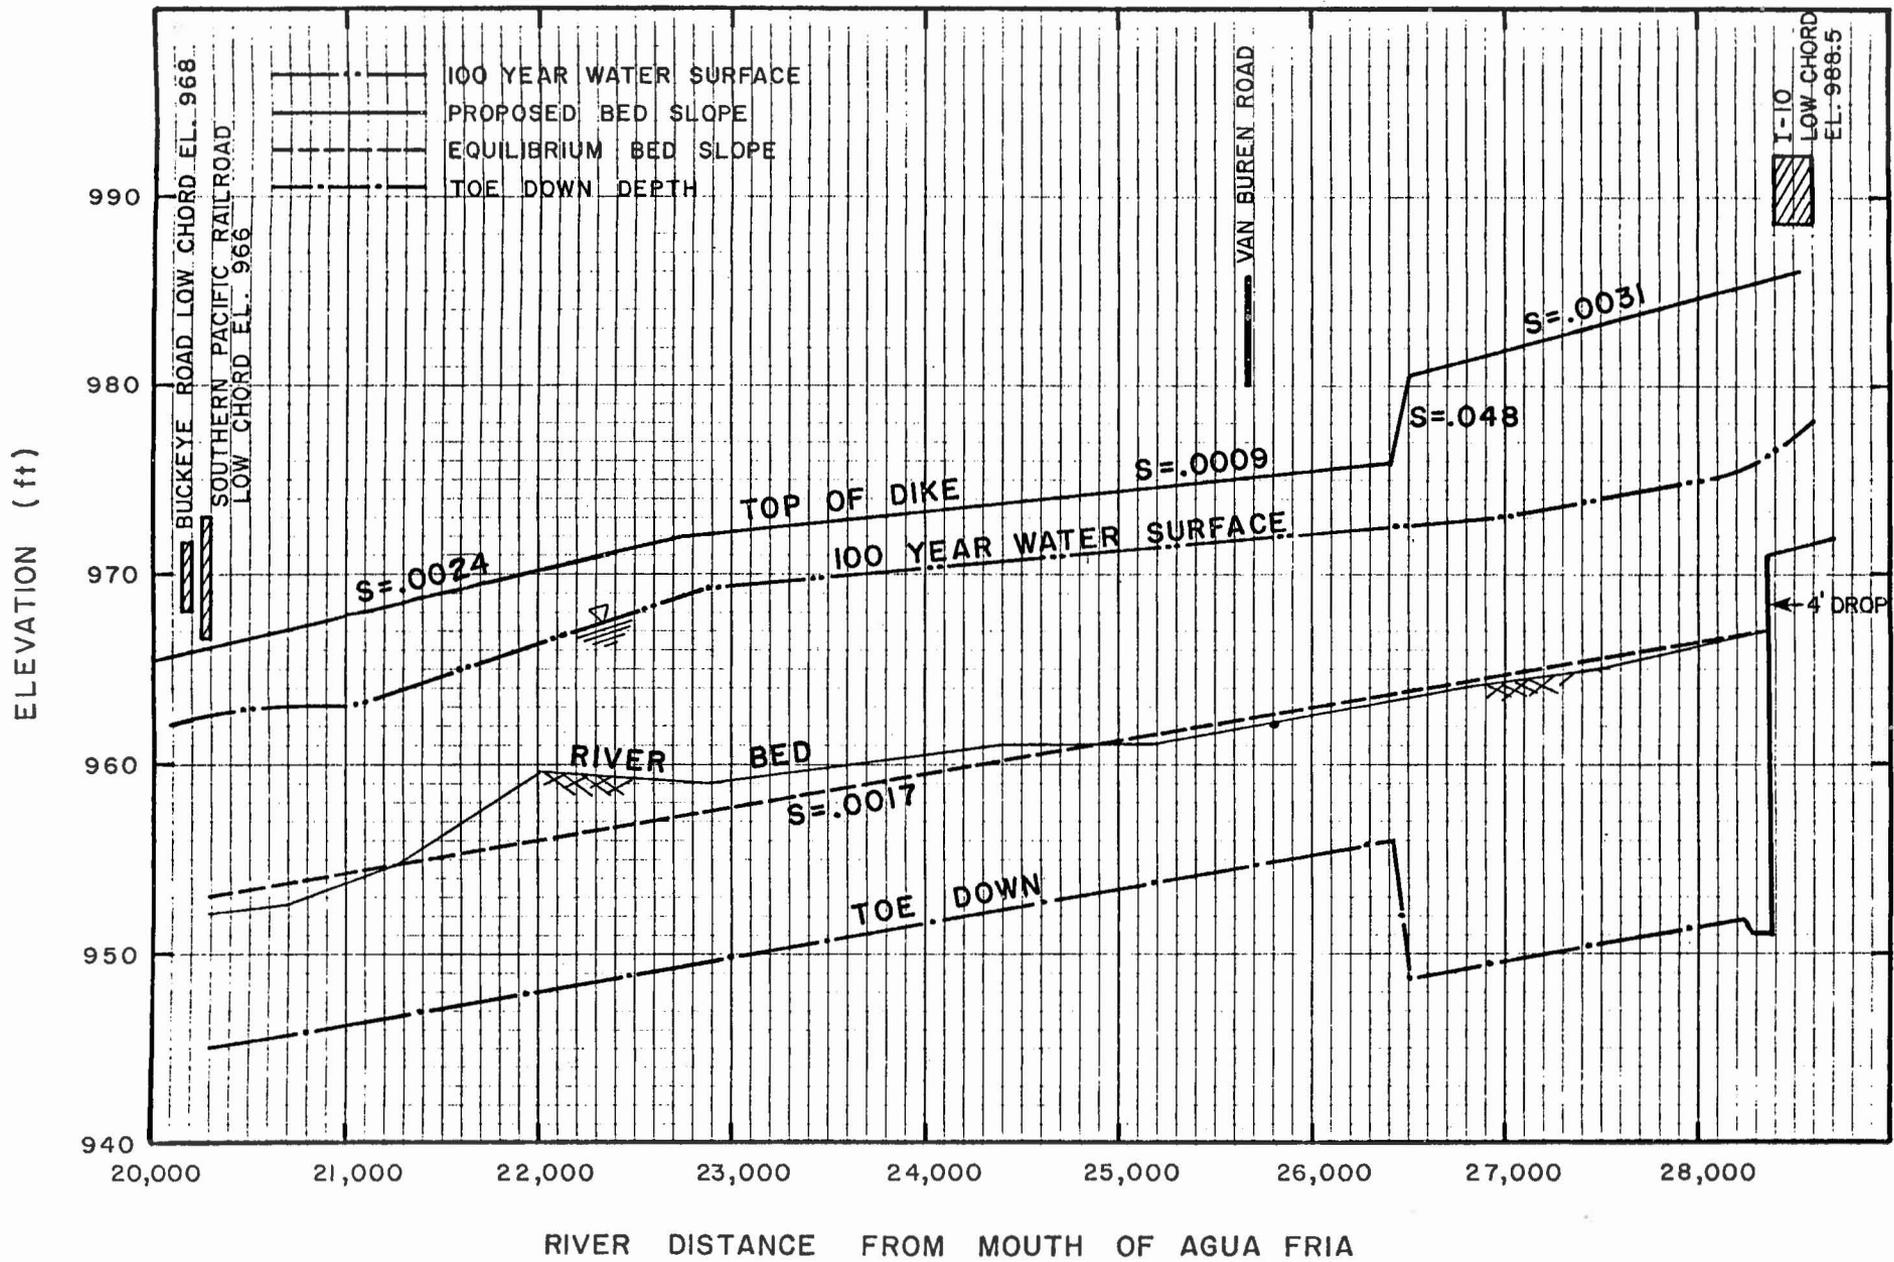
Proposed bed profile, equilibrium bed profile, 100-year water surface, levee heights and toe down depths between Buckeye Road and I-10 for west bank.
